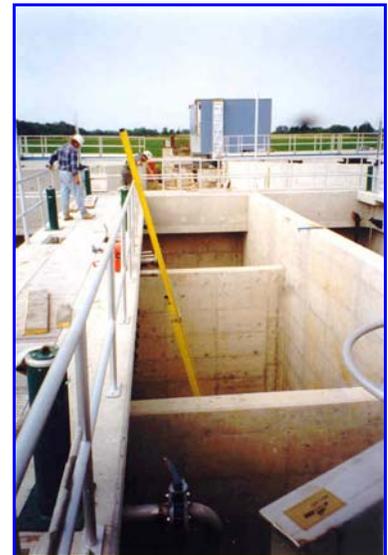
(right): The Kingsville facility - aeration tanks under construction in the summer of 1998 – forefront wall of the tank (not visible on this photo) is separating the tanks and the mechanical rooms, shown in Figures 22 and 24
